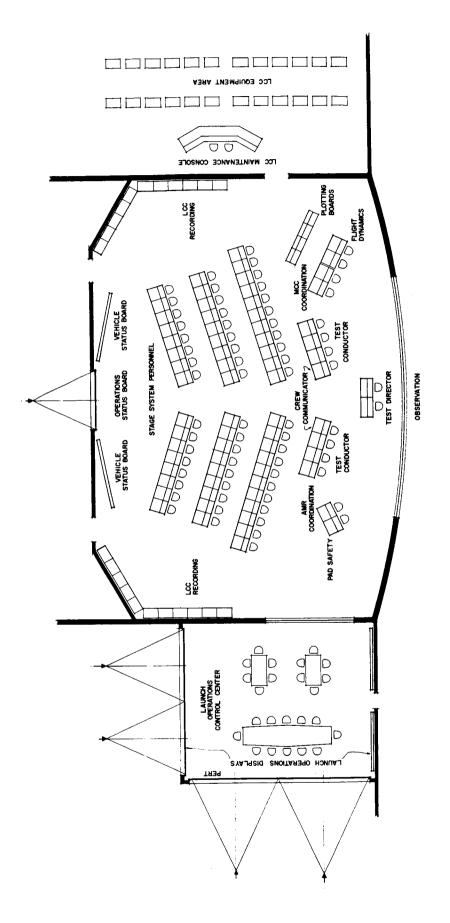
Floor Plan for Launch Control Center Operating Area
